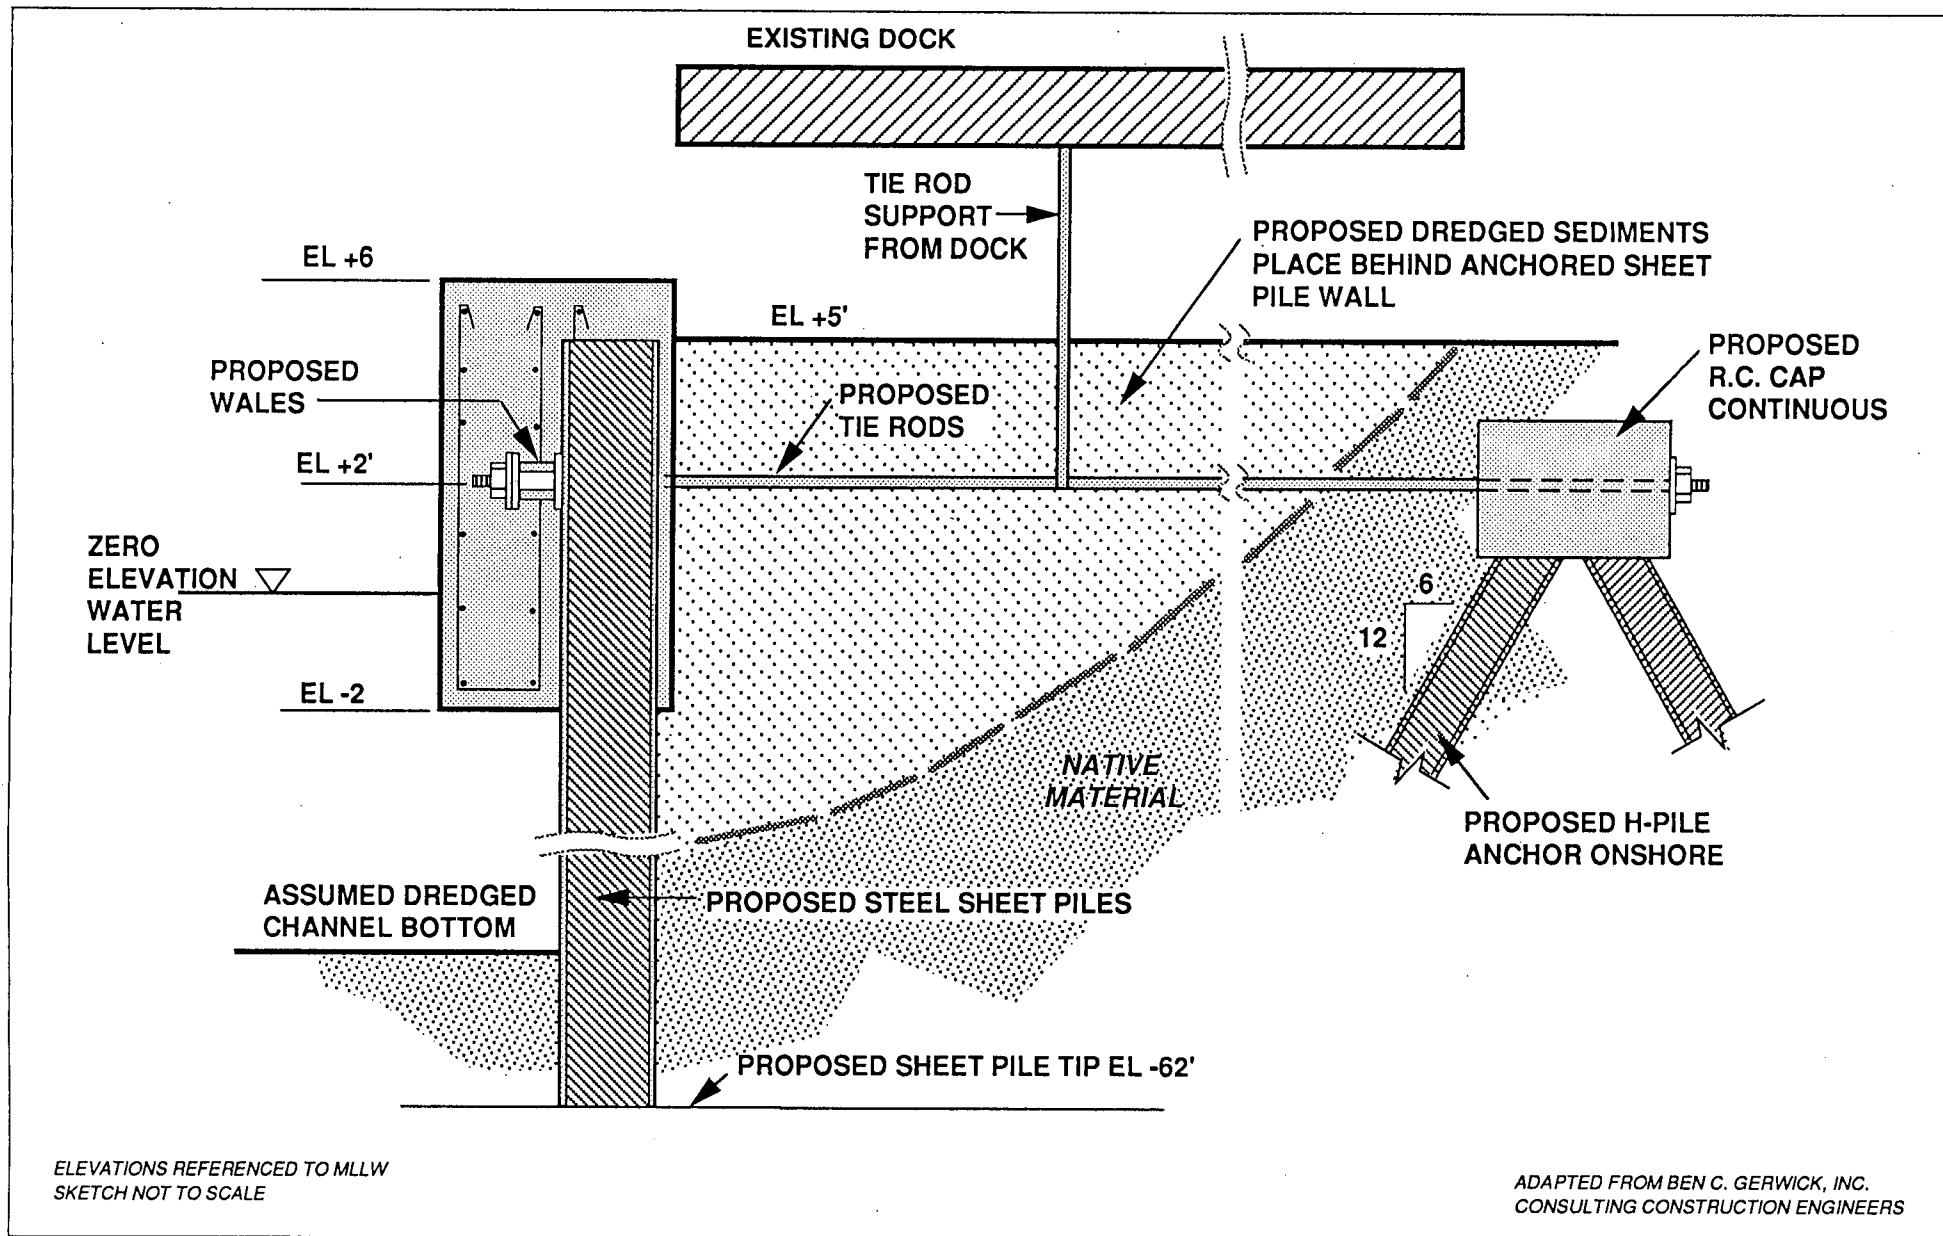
CROSS SECTION OF PROPOSED ANCHORED BULKHEAD ALONG WHARF
